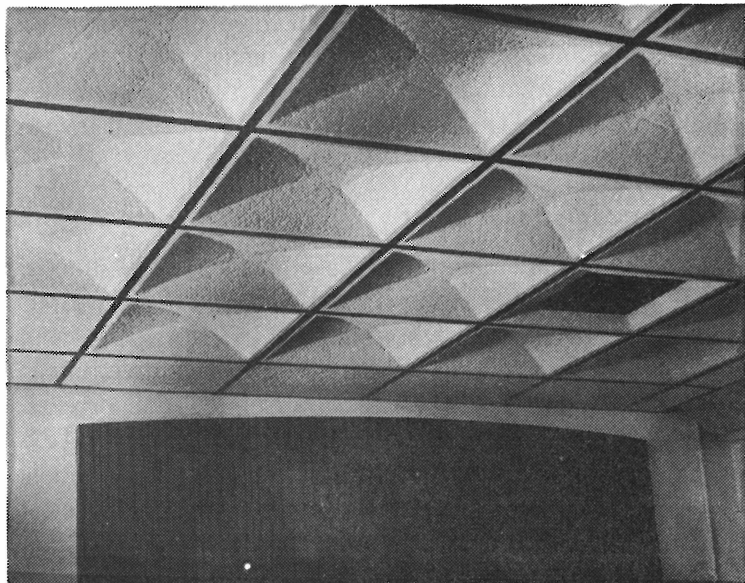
Appearance of completed suspended ceiling in studio. To accent the 3-dimensional effect of the ceiling the room was illuminated by indirect light from fluorescent tubes over the observation windows.
